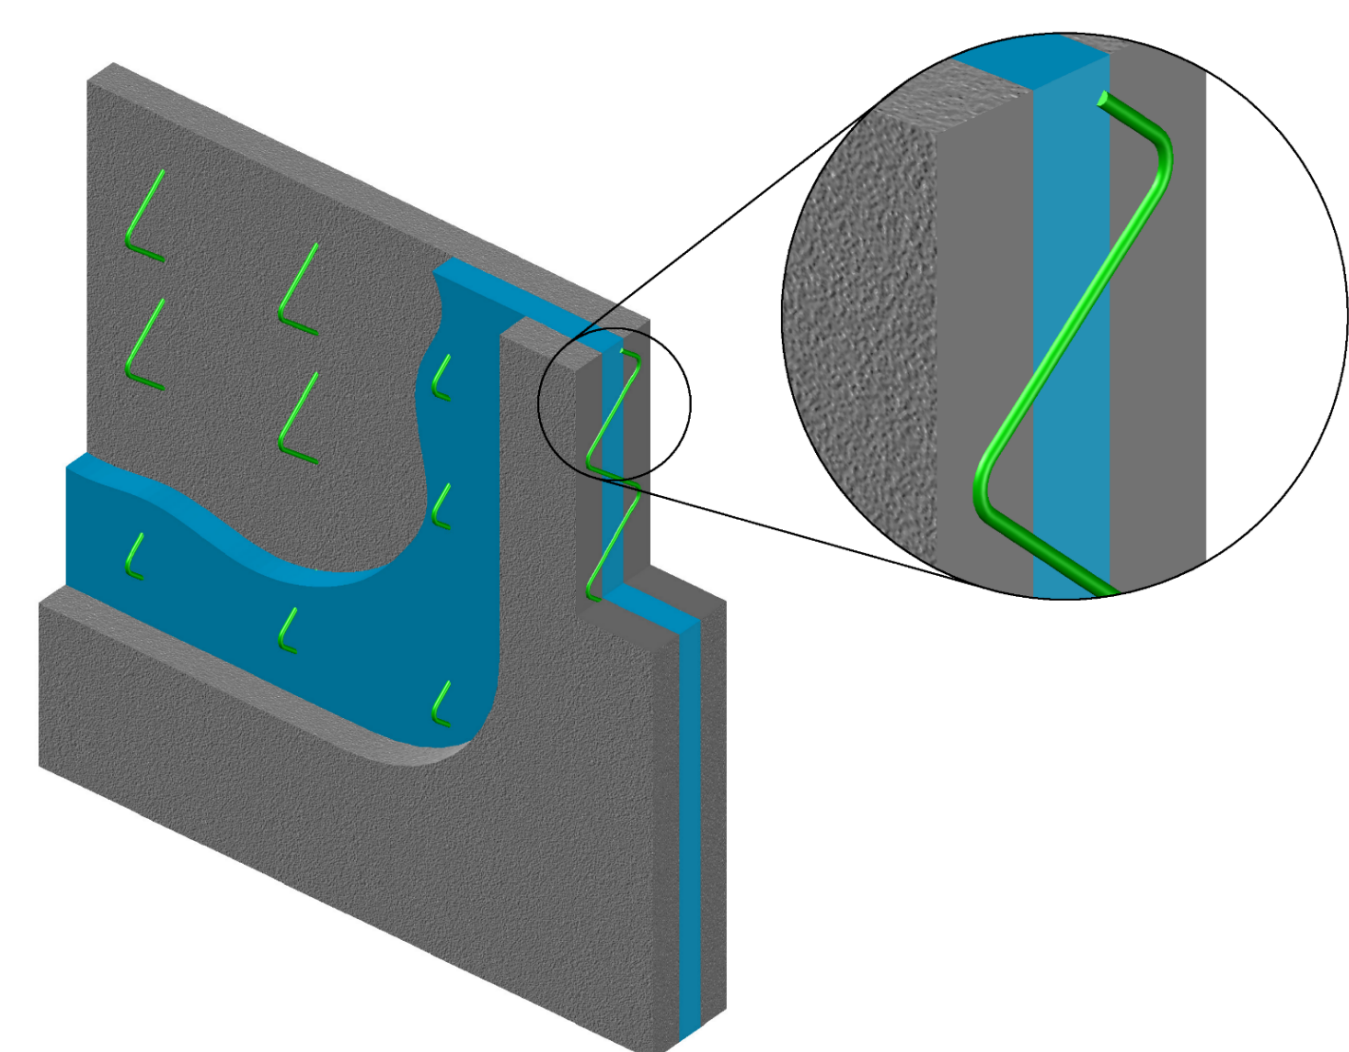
Concrete Sandwich Wall Panel with Company A Connections
